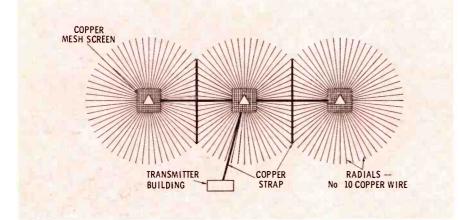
Strap joins radials, tower bases, and building at a directional installation.
